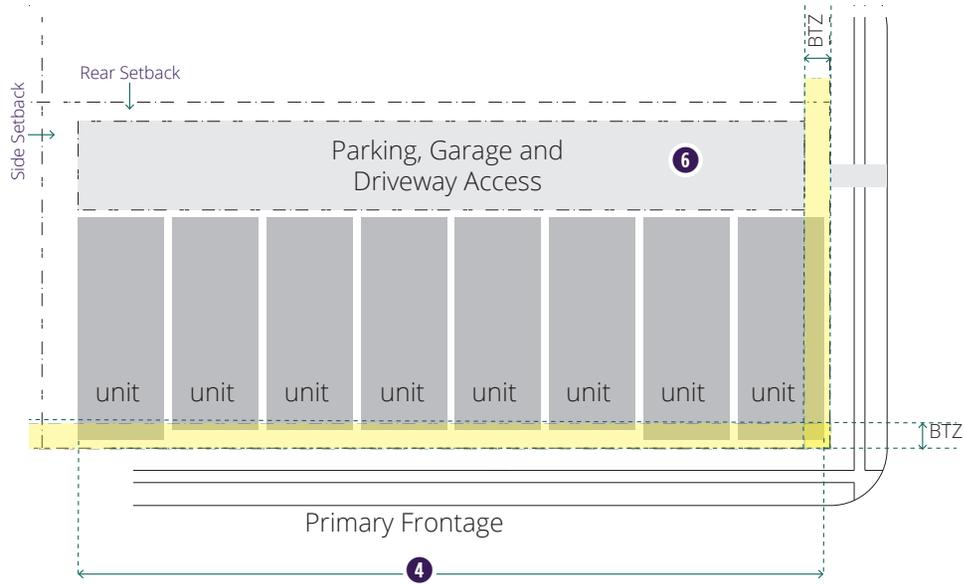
D-17. Rowhouse Building Length and Garage Access
